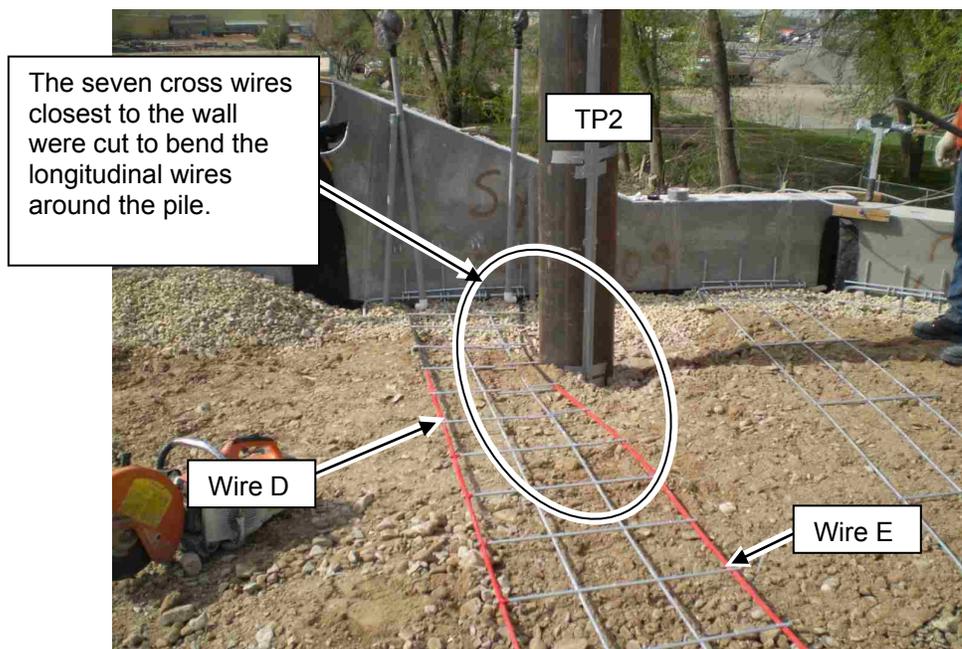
View of the longitudinal wires that were instrumented near TP2 (U.S. Highway 89 site).
